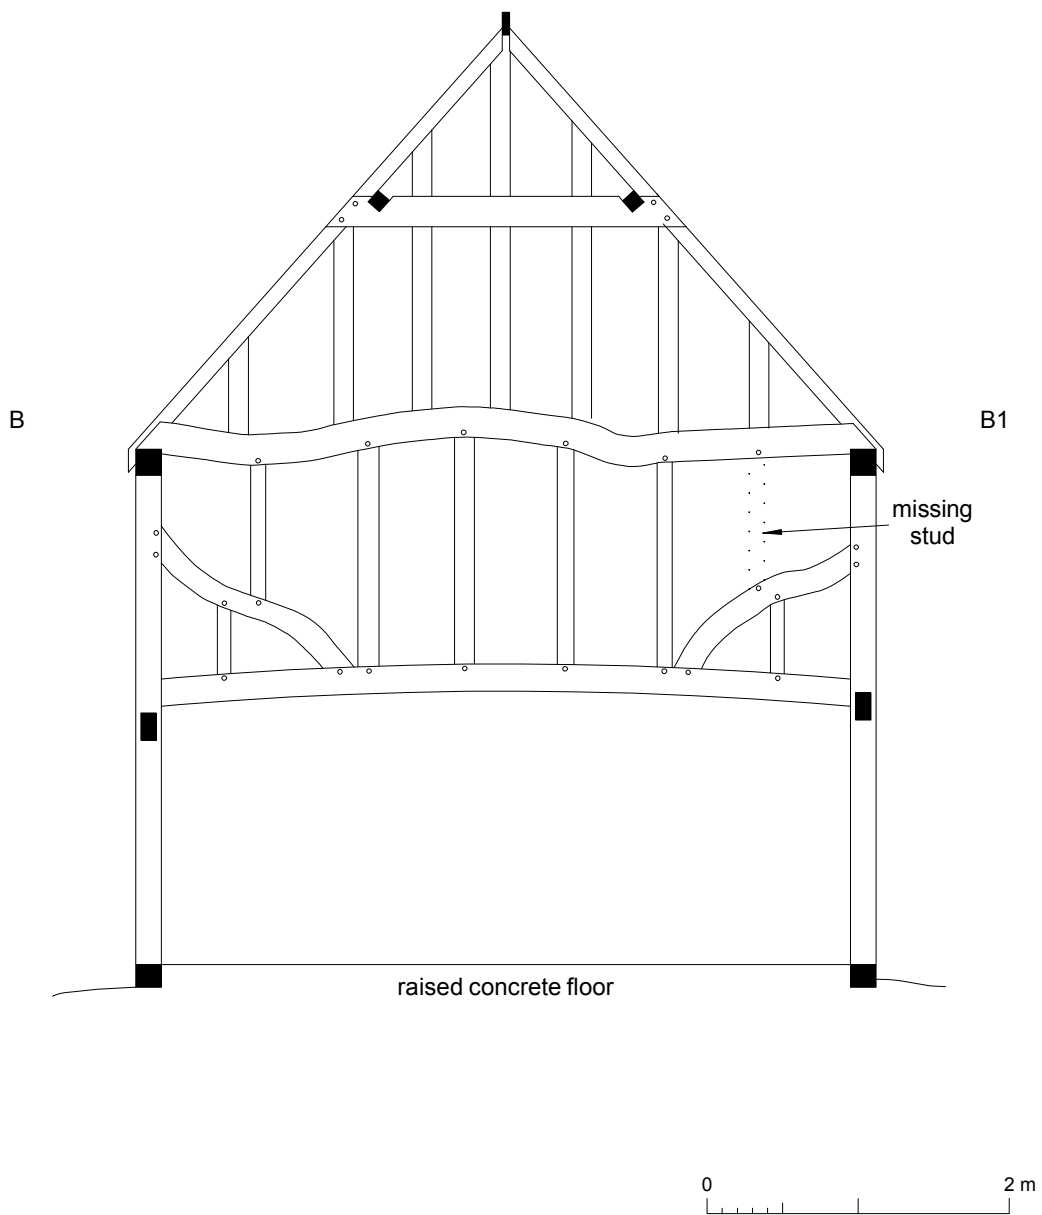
Barn 1, structure 1d: cross-section of truss B.
